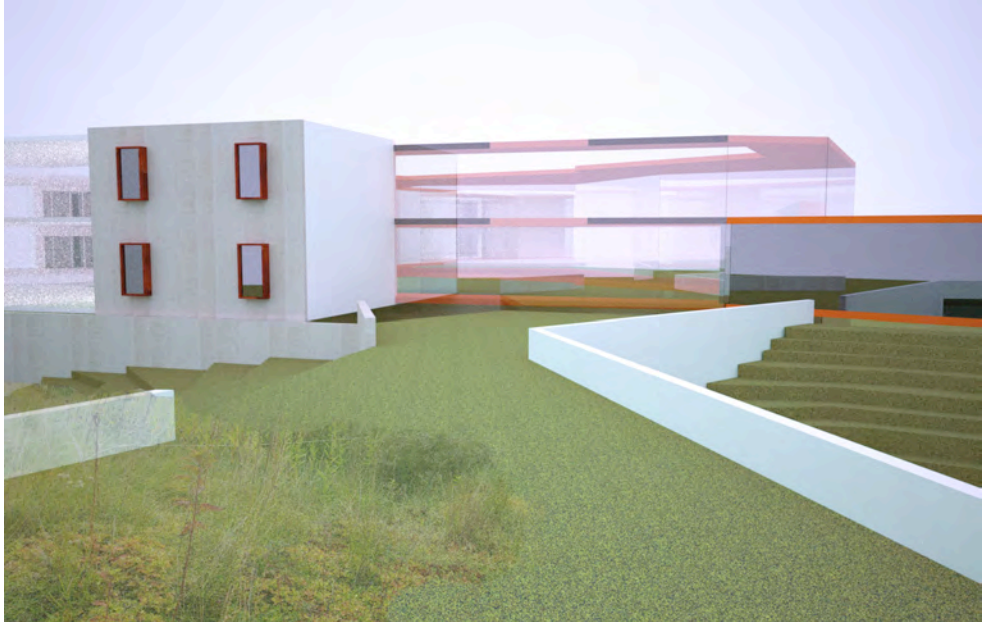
Exterior Rendering: view looking north from a roof top garden.
